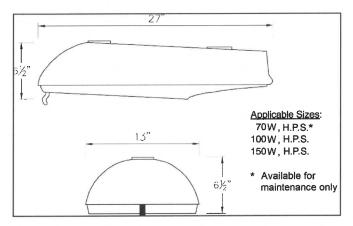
Typical Horizontal Luminaire, Flat-Glass Type
